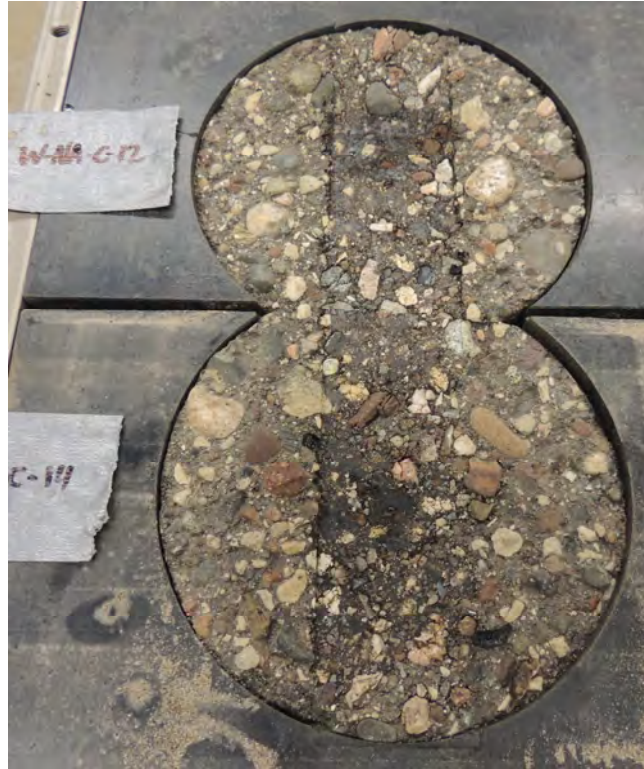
Specimen without chip seal from Newbury Alcove Cul de Sac in Woodbury, MN, after Hamburg test
